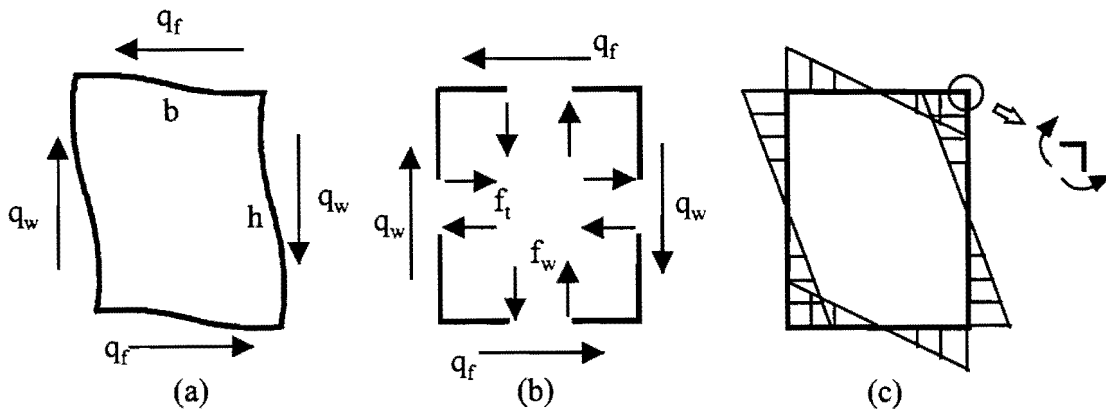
Out-of-Plane Bending Stresses in Box Girder Distortion
